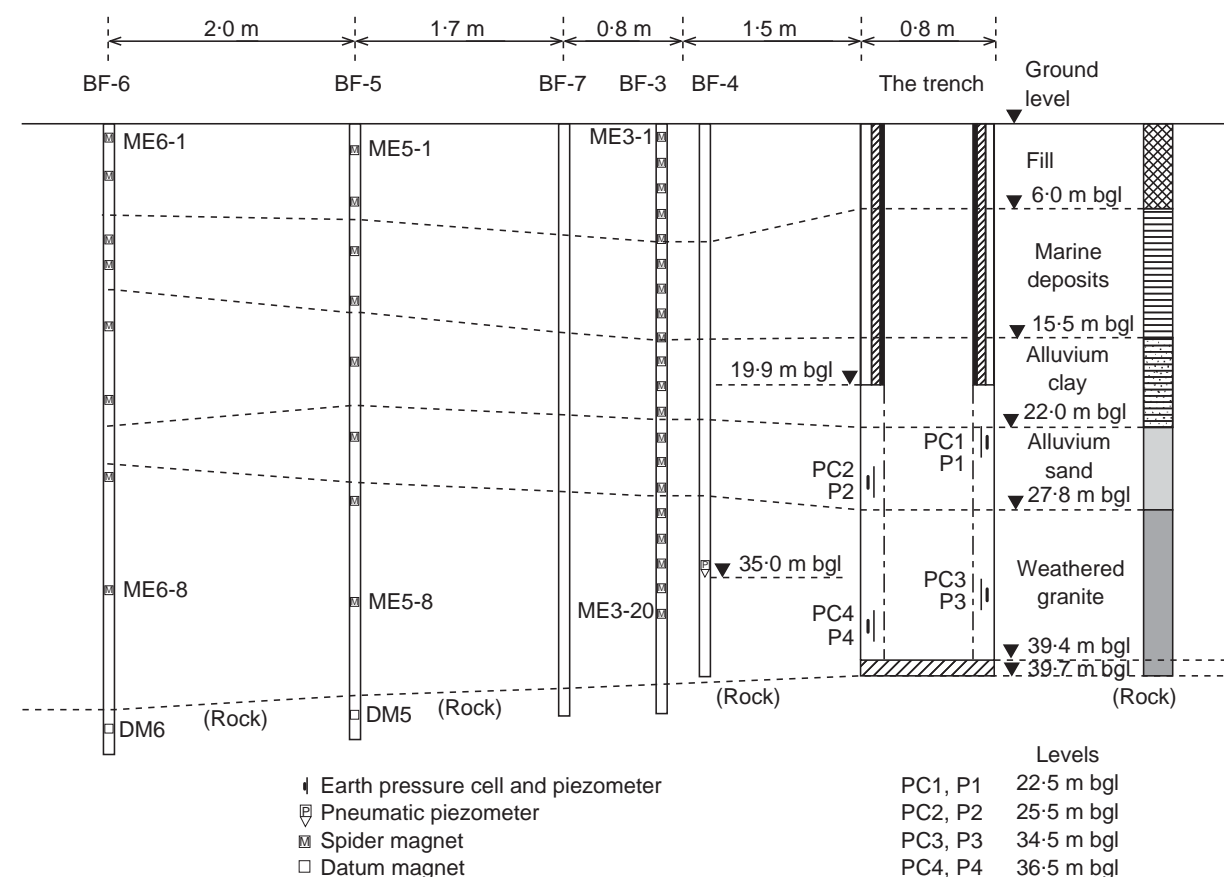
Typical schematic cross-section A-A showing layout of instrumentation (not to scale)
